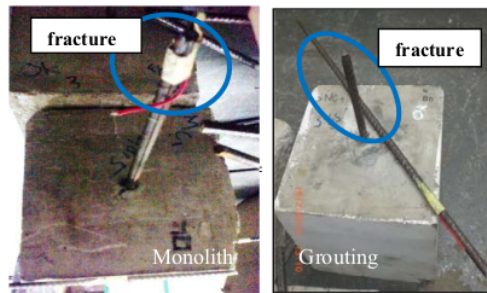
The failure pattern of experiment specimen with steel bar embedded into concrete 200 mm
